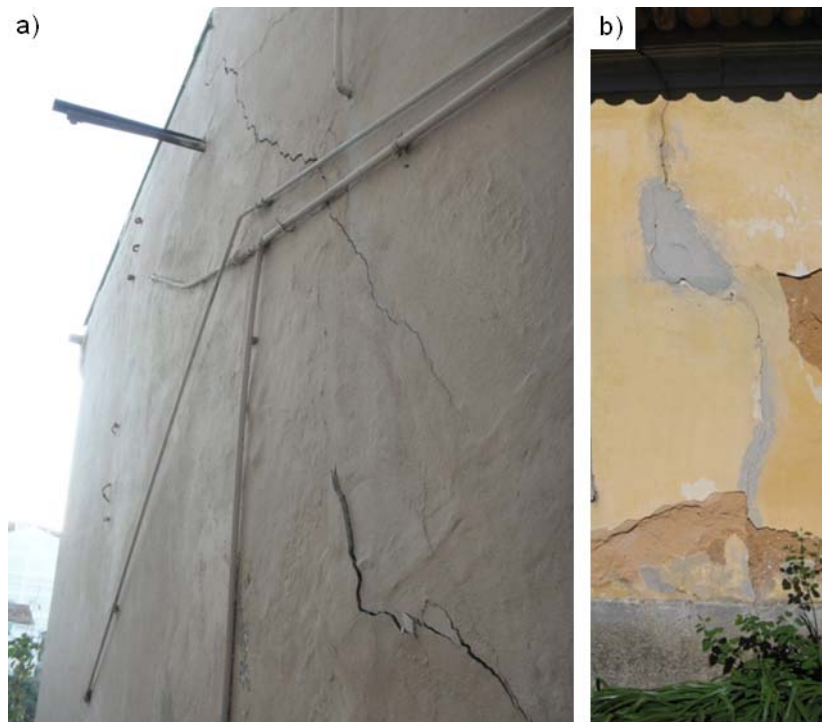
a) Diagonal cracking; b) vertical cracking in the central area of the wall.
